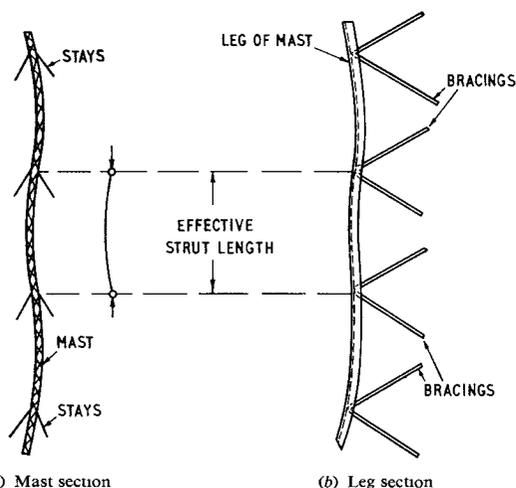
DEFORMATION OF SECTIONS UNDER COMPRESSIVE LOAD
